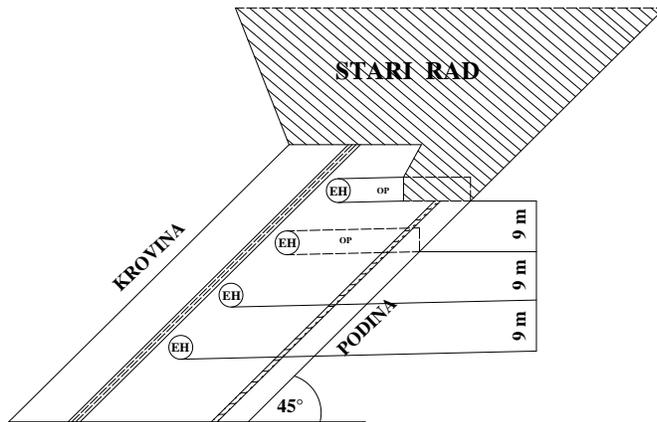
Cross section of coal seam in Soko coal mine layer roadway
